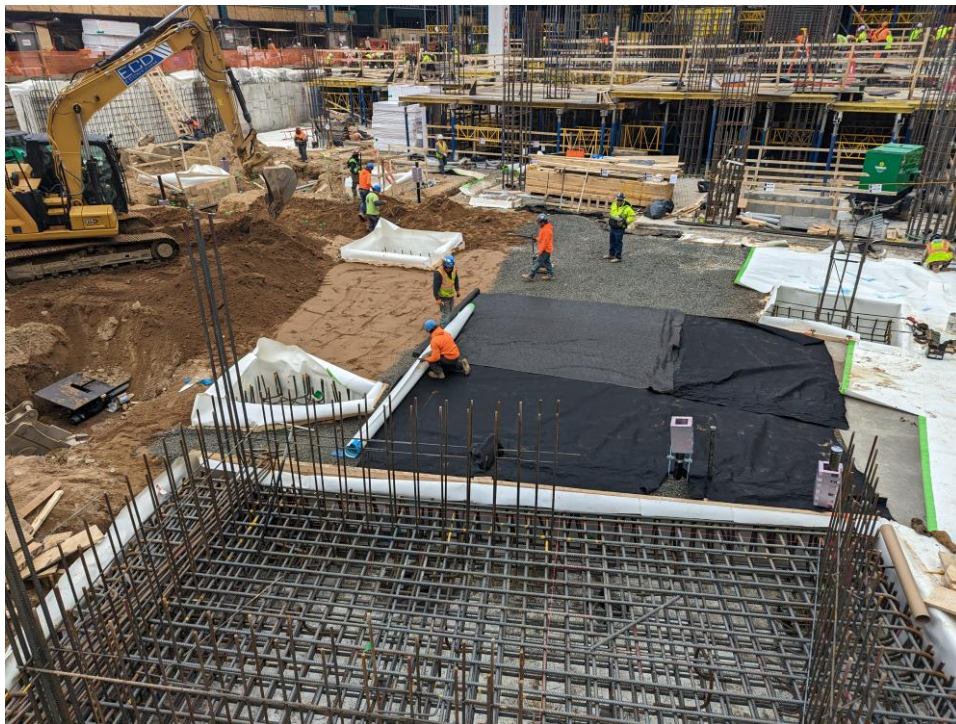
ECD installing waterproofing in the southern part of the site (WCG A/E, facing north).
